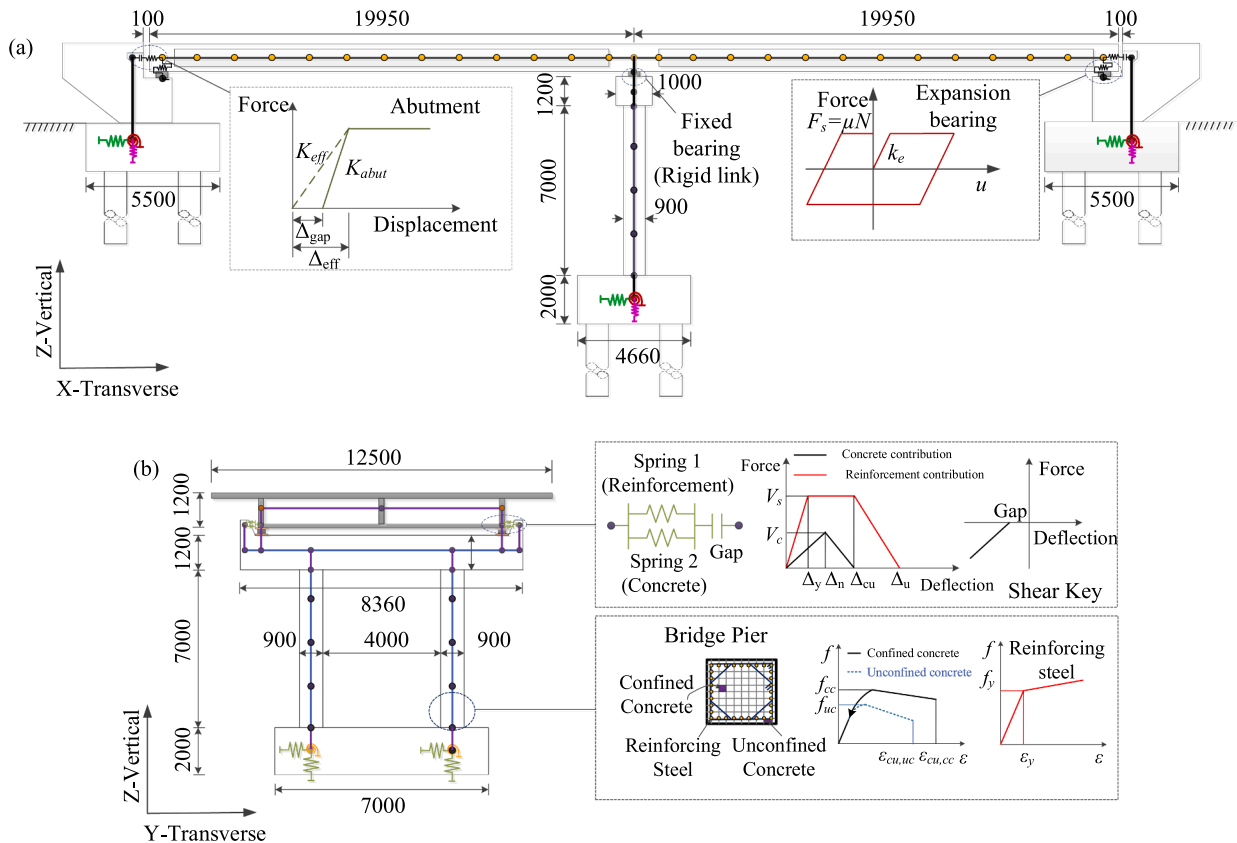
(a) Configuration for the prototype bridge and (b) elevation view of the pier (unit: mm).
